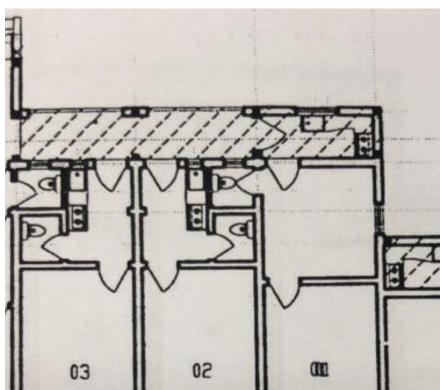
Detailed Renewal Plan for Tianlin Second Village
